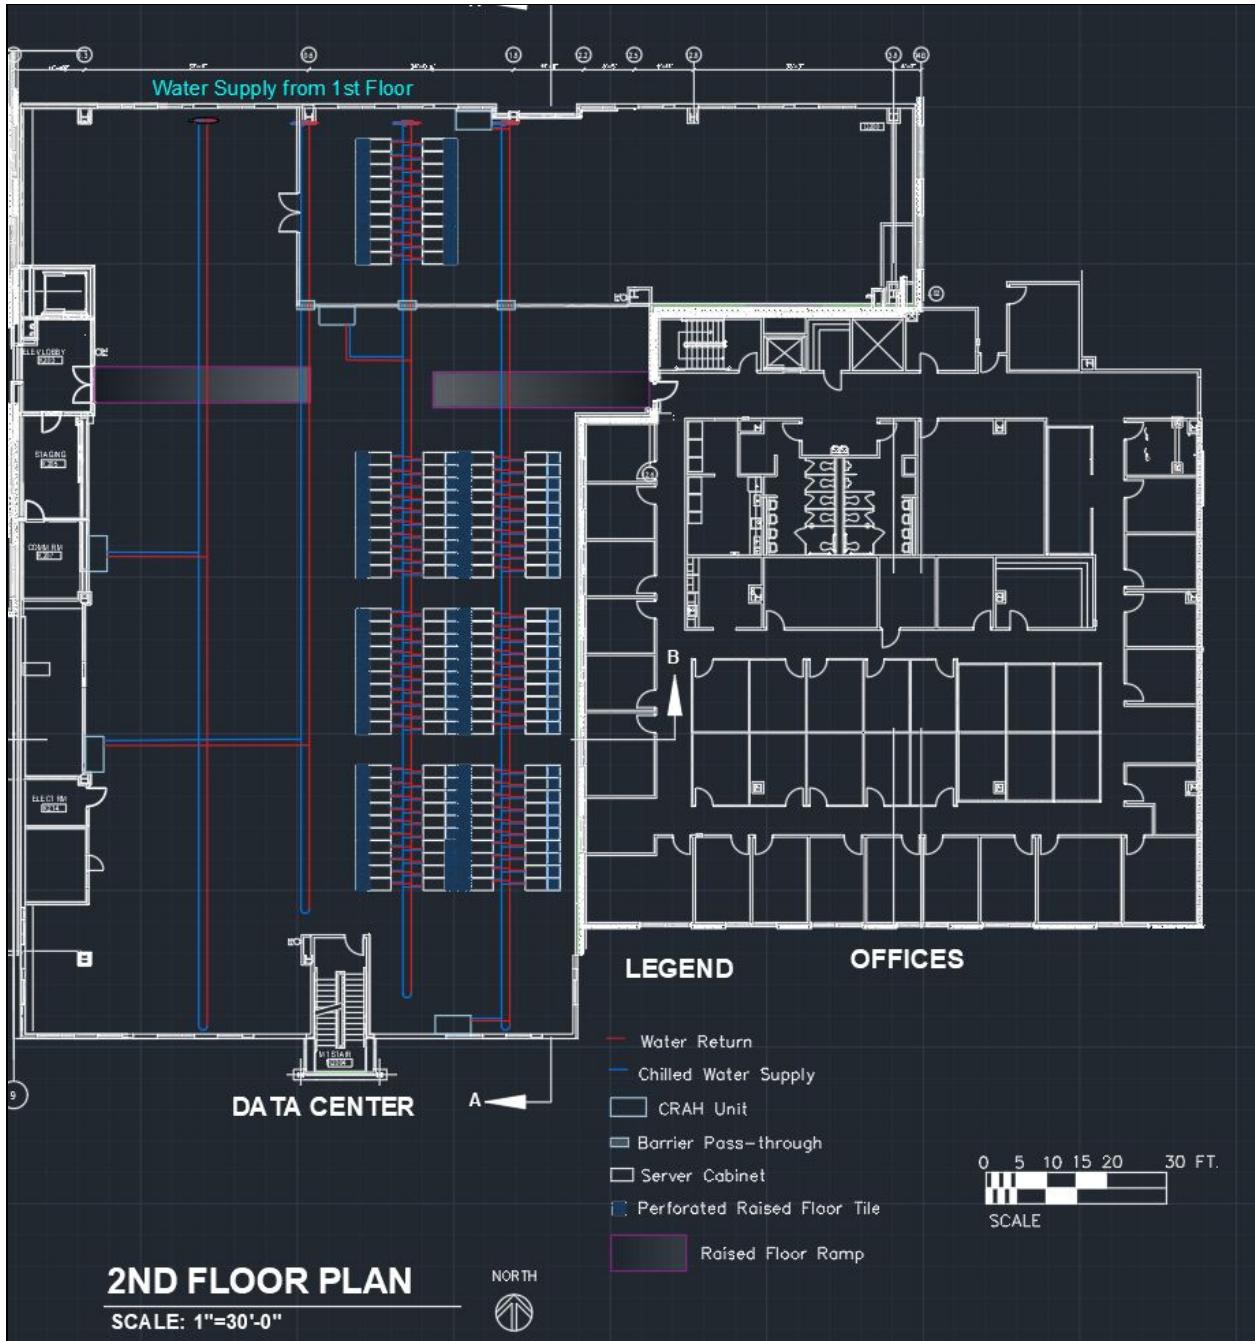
The floor layout for the proposed cooling solution utilizing rear door heat exchangers.
